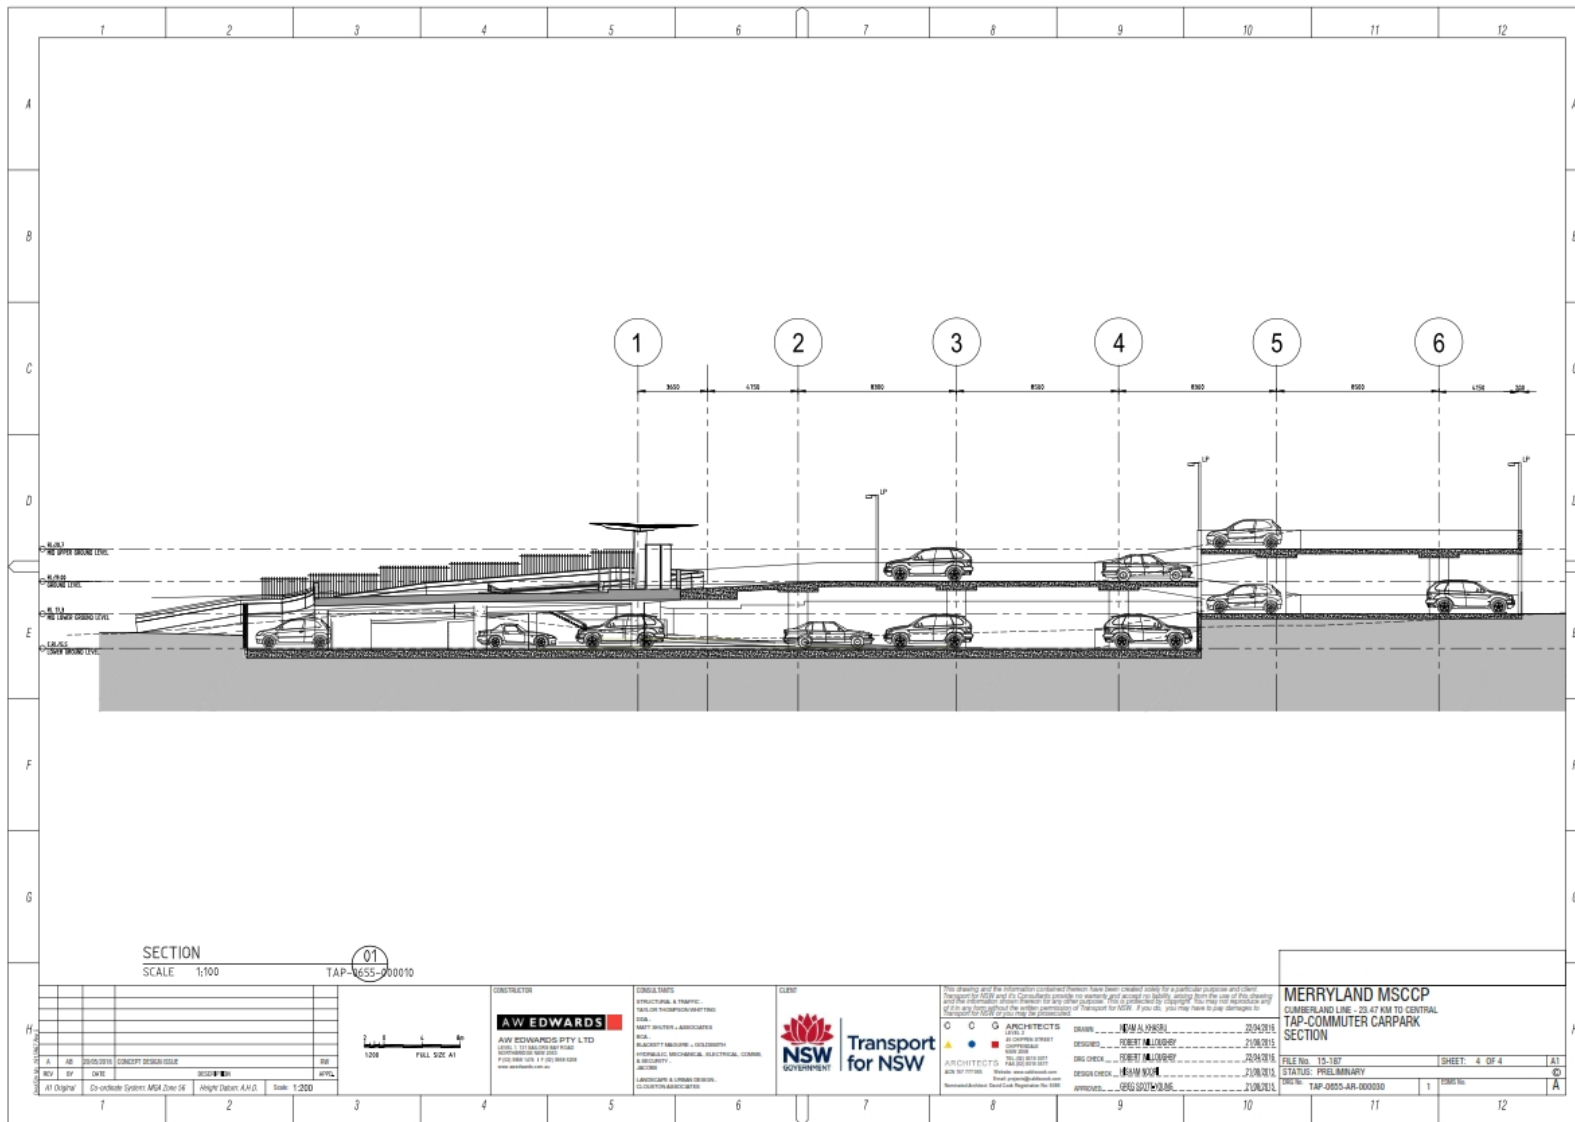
Proposed section of Site 1 car park (Source: TfNSW)
